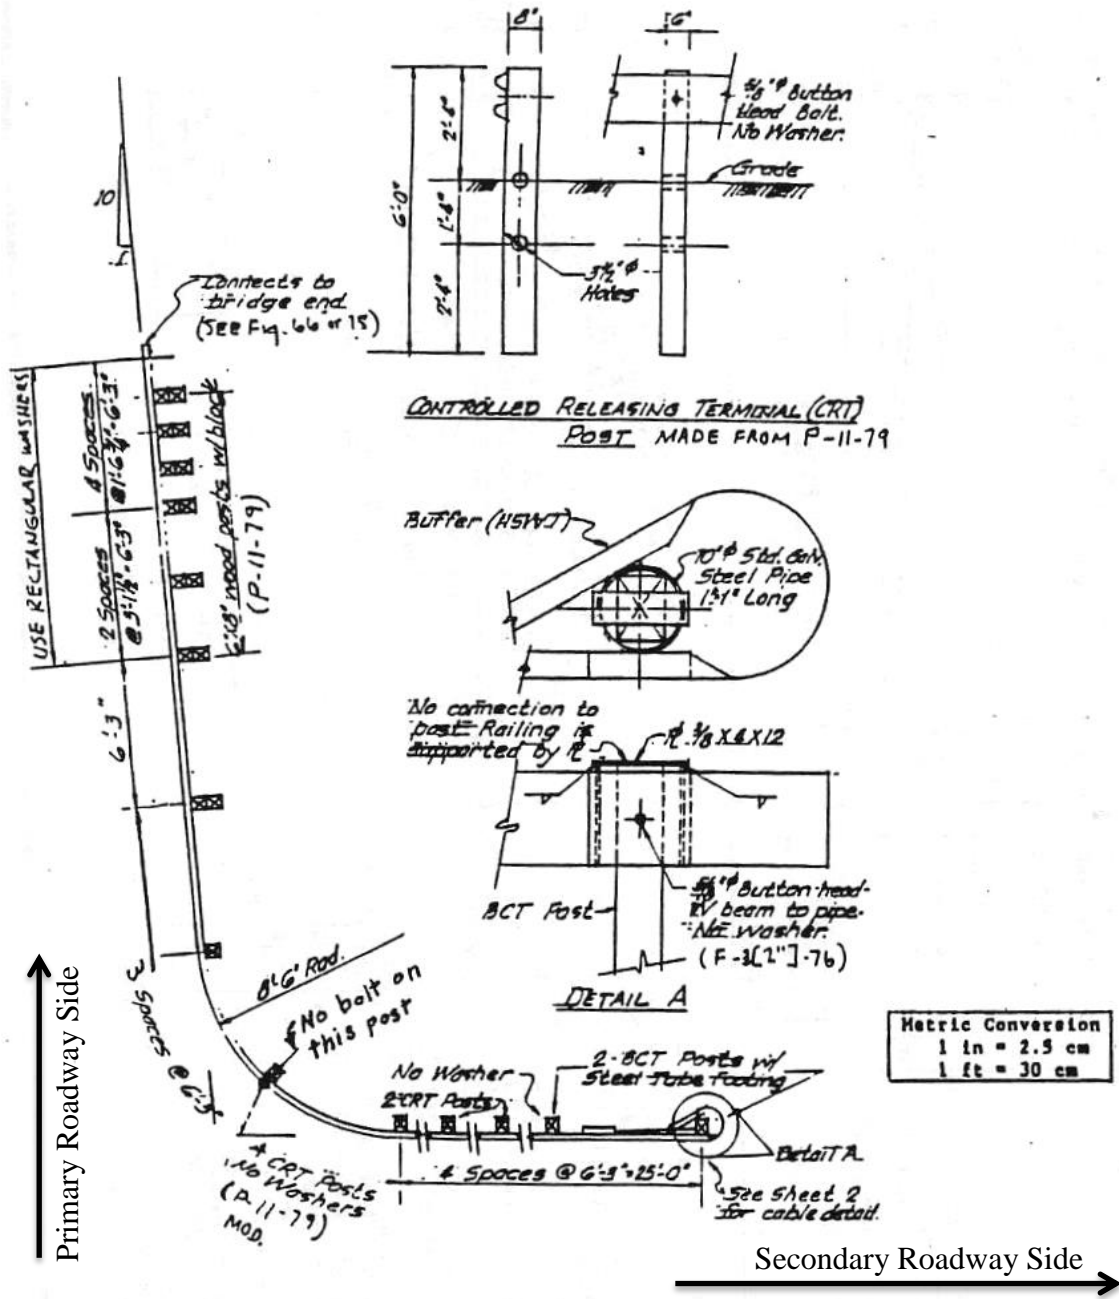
Washington W-Beam Short-Radius Guardrail System [9]
